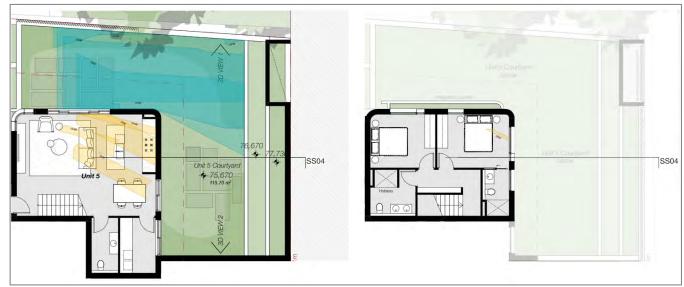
Extract of DWG No. 9415. Unit 3 has been reconfigured to be a double level unit with a living room on the ground floor and bedrooms on Level 1 (Source: MHNDU)
